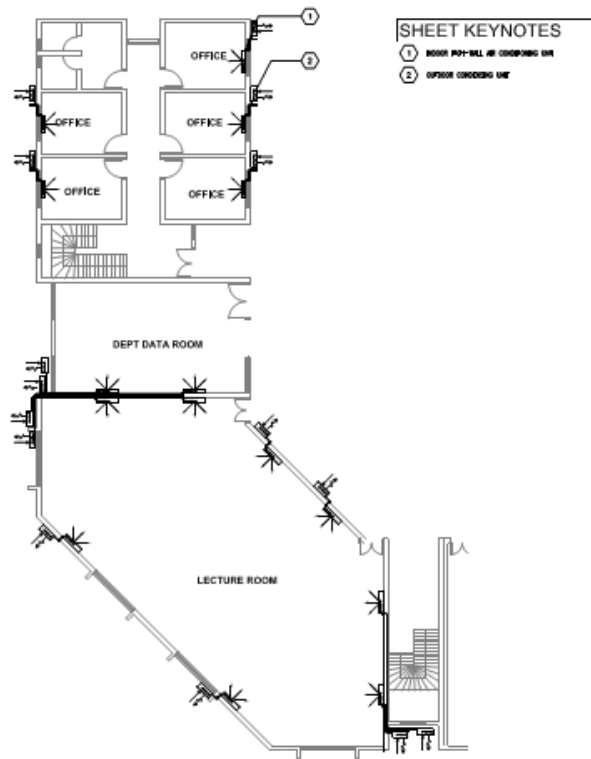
Mini-Split System Division 2 Ground Floor Plan
